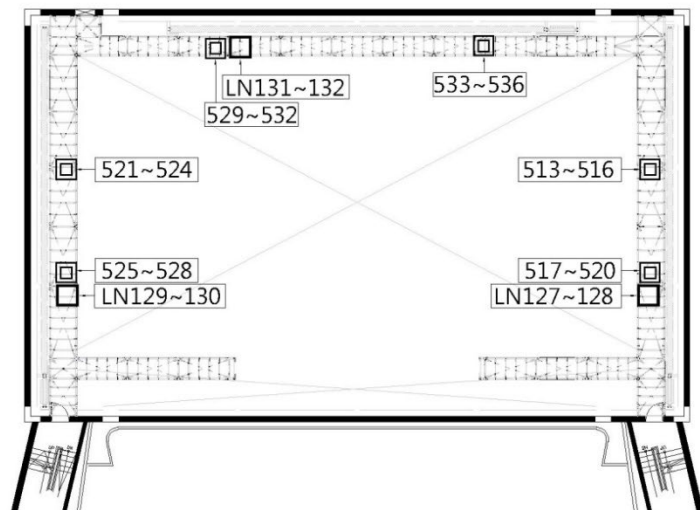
The Fourth Floor Gallery Lighting Circuit Layout
